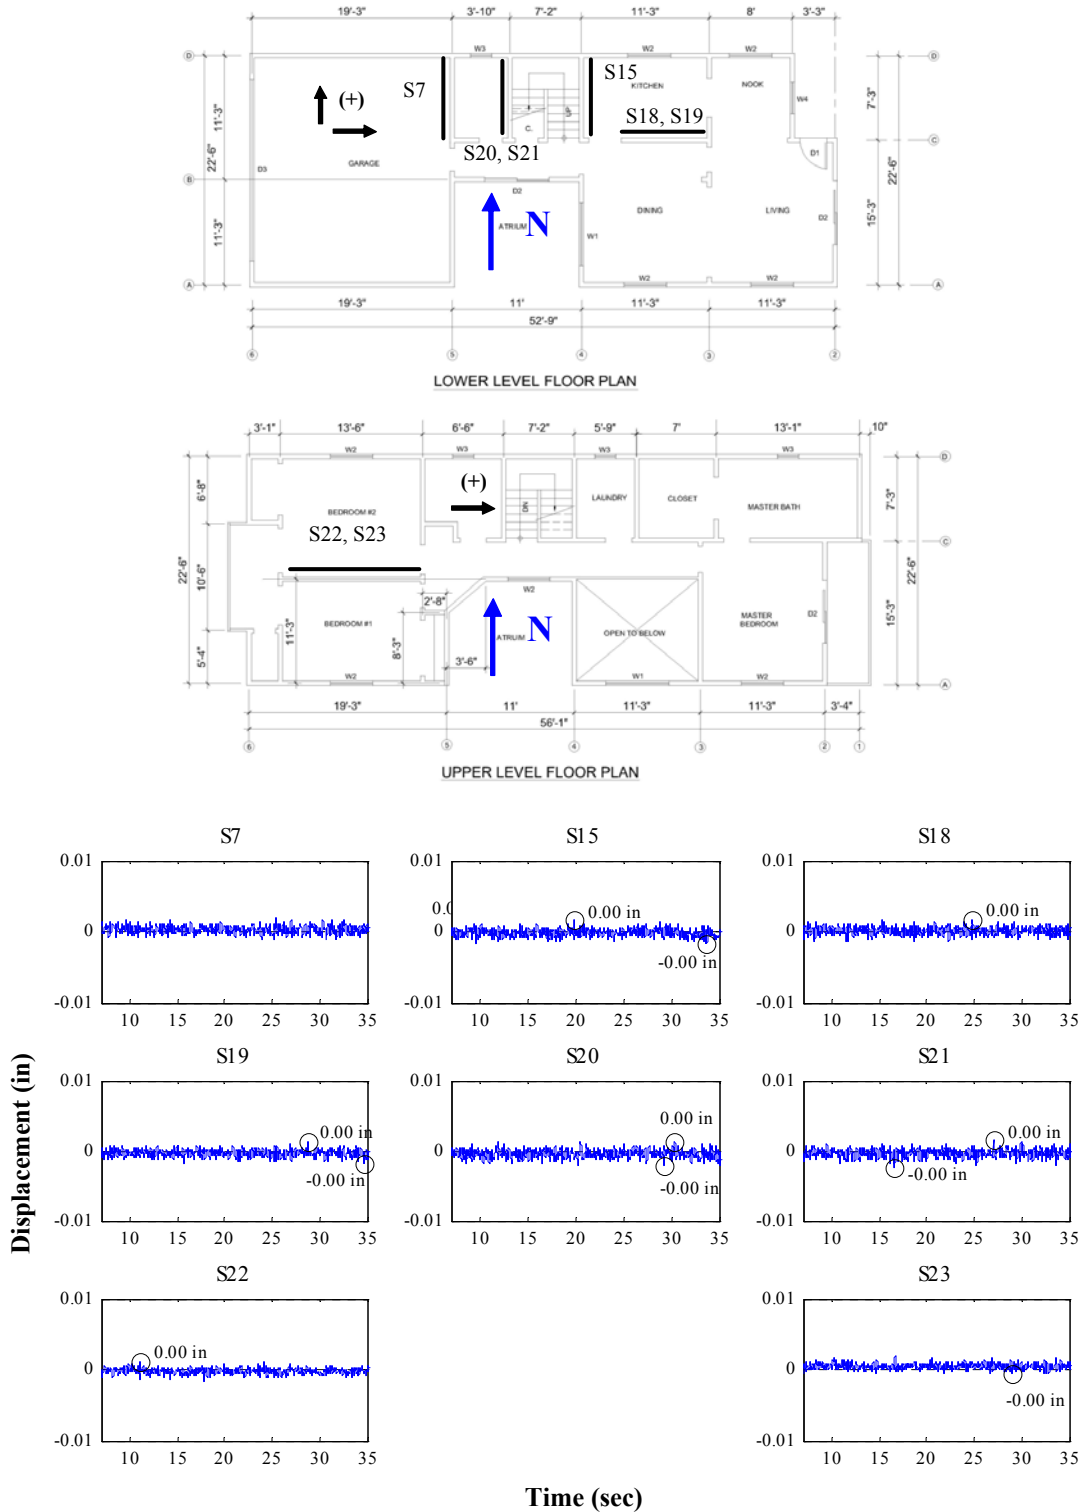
Wall deformations of internal walls for Test NWP1S03
